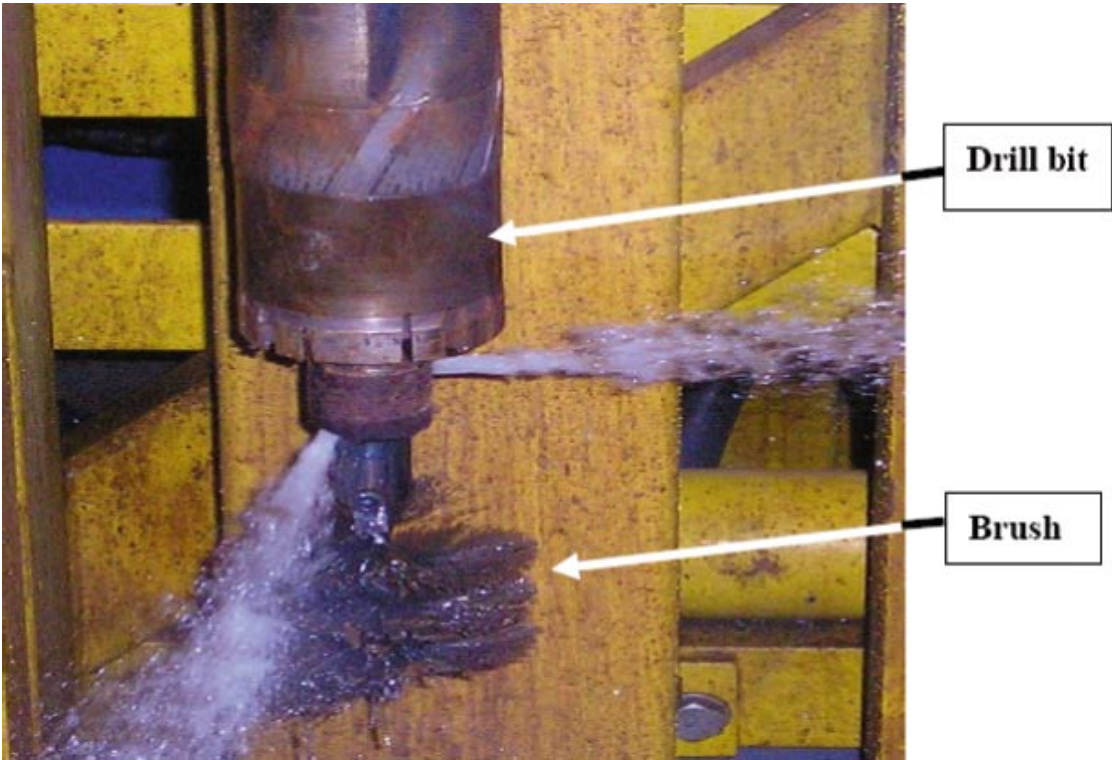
The water flushing and rotating steel brush tool. The tool is lowered into the drill stem and can be seen in place just below the drill bit. During operating the drill string is moved up and down to remove loose rock fragments from the borehole wall.
